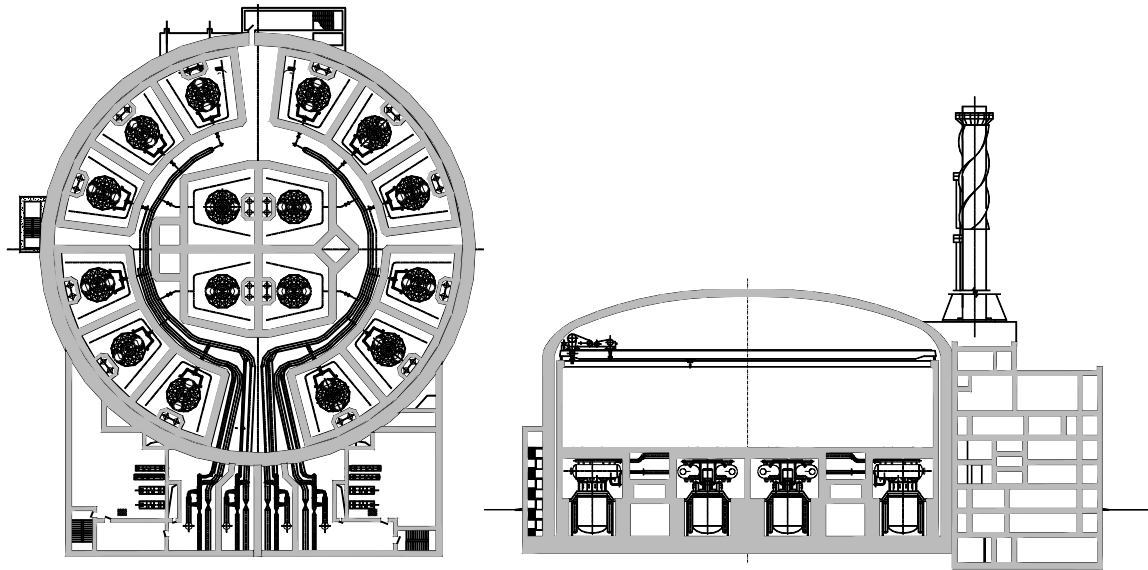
A plan and a longitudinal section of the main building of the NSSS of SVBR-75/100.
